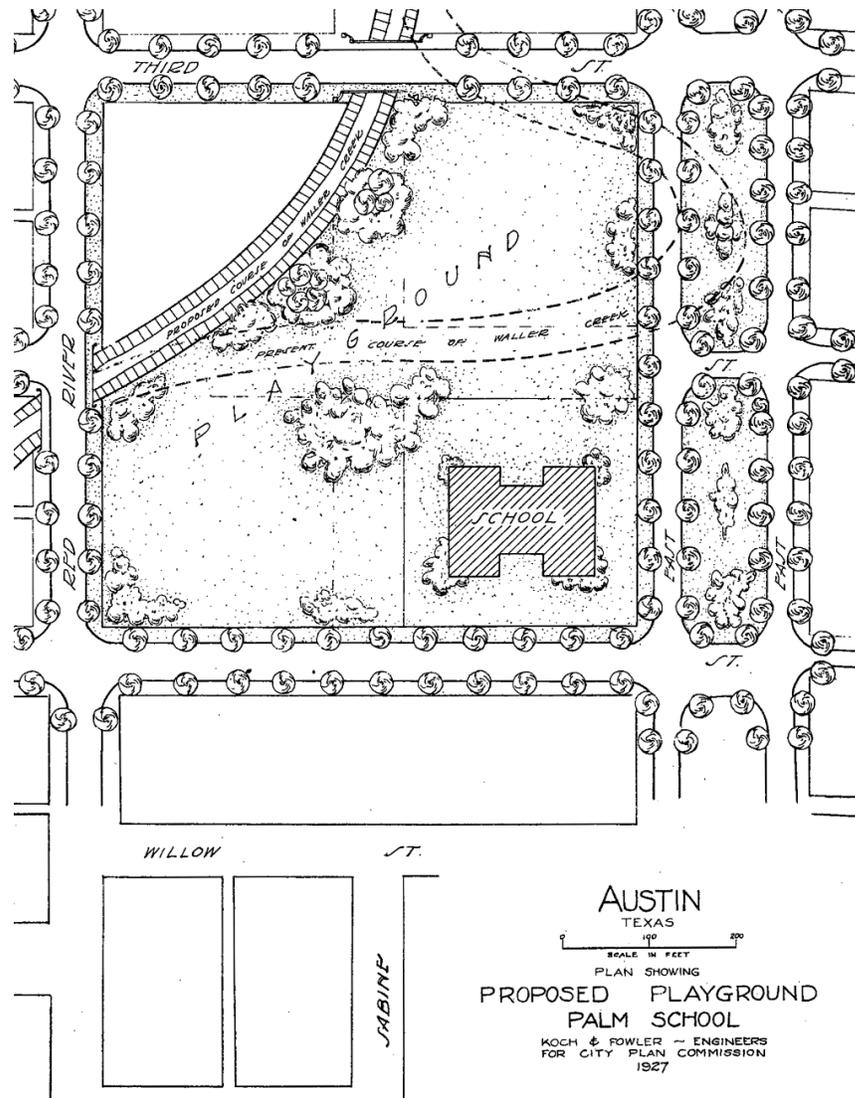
Original Palm Park plan in 1928 Koch and Fowler city plan showing the original and proposed routes for Waller Creek.¹⁴
